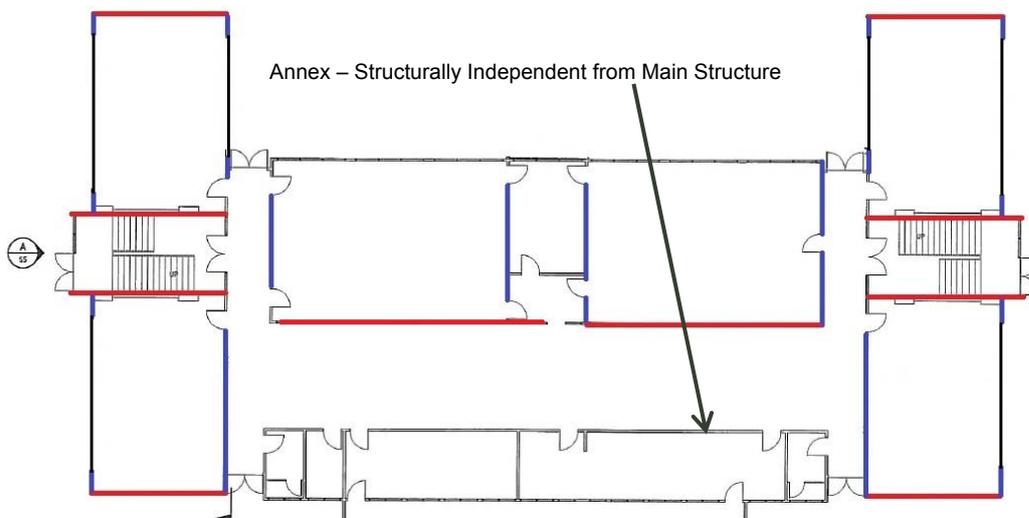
Typical Nelson Block Bracing Layout - Ground Floor
